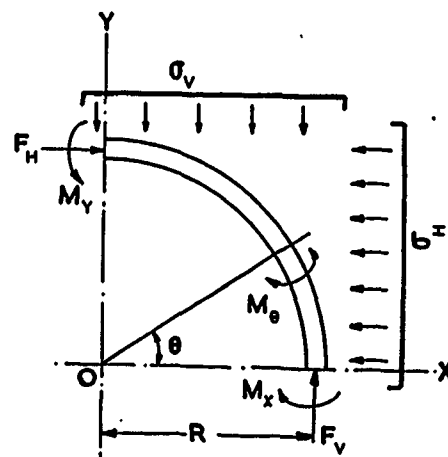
PENETRATION LINER BI-DIRECTIONAL CONCRETE STRESS
